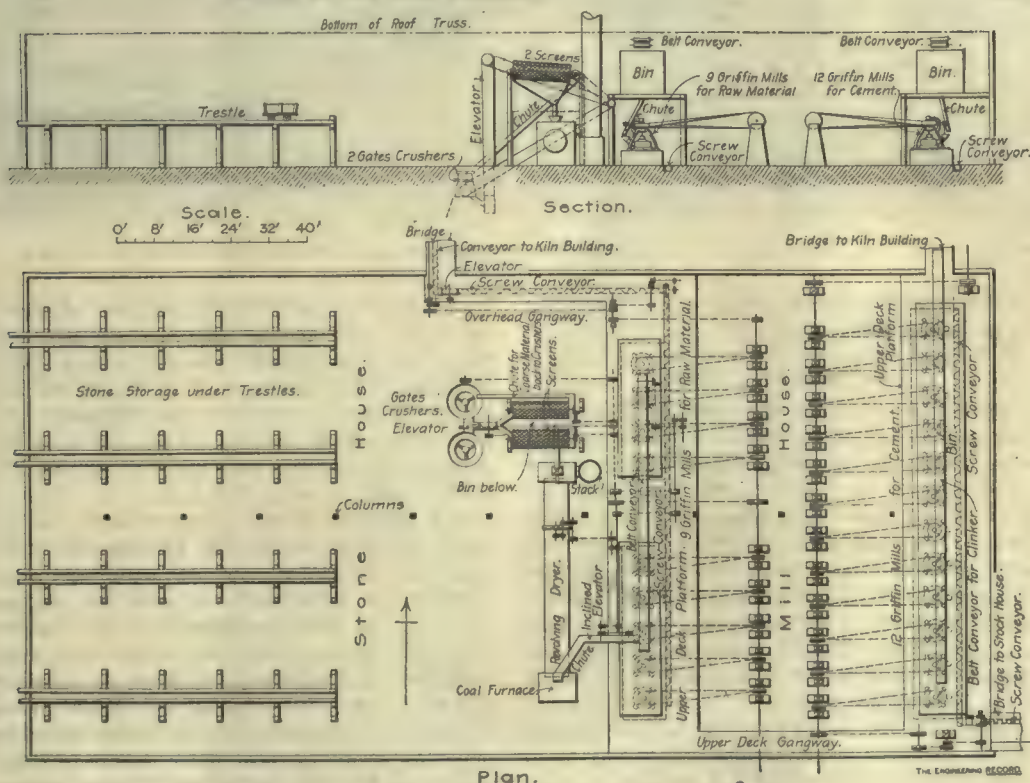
THE STONE HOUSE AND MILL BUILDING.
